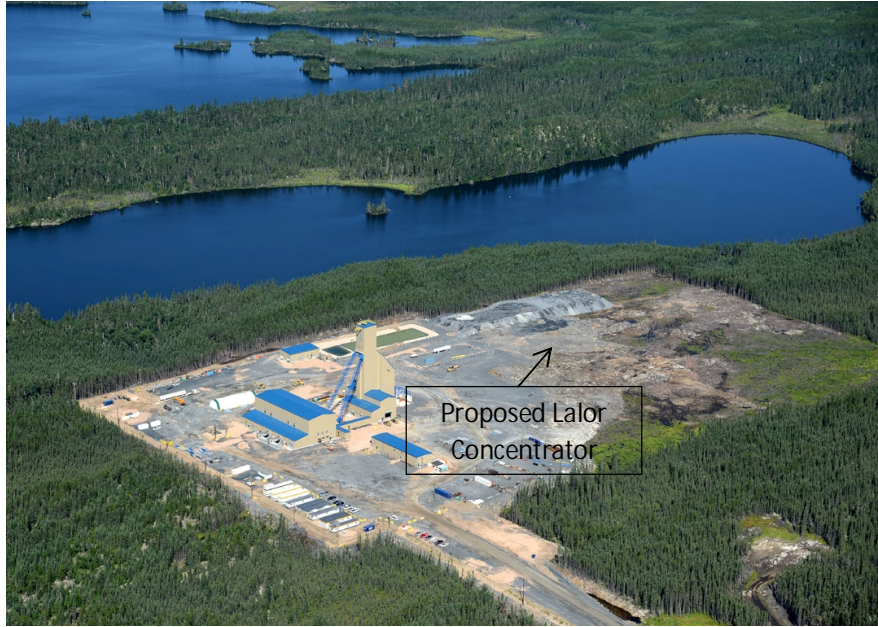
Aerial view of the Lalor site, looking northwest and showing the location of the proposed Lalor Concentrator.
